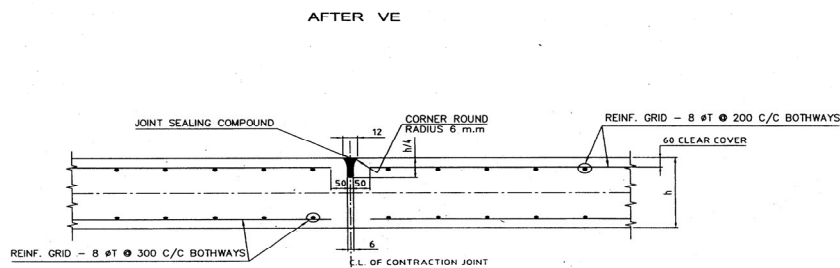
Typical Detail of the Contraction Joint without Dowel Bar
